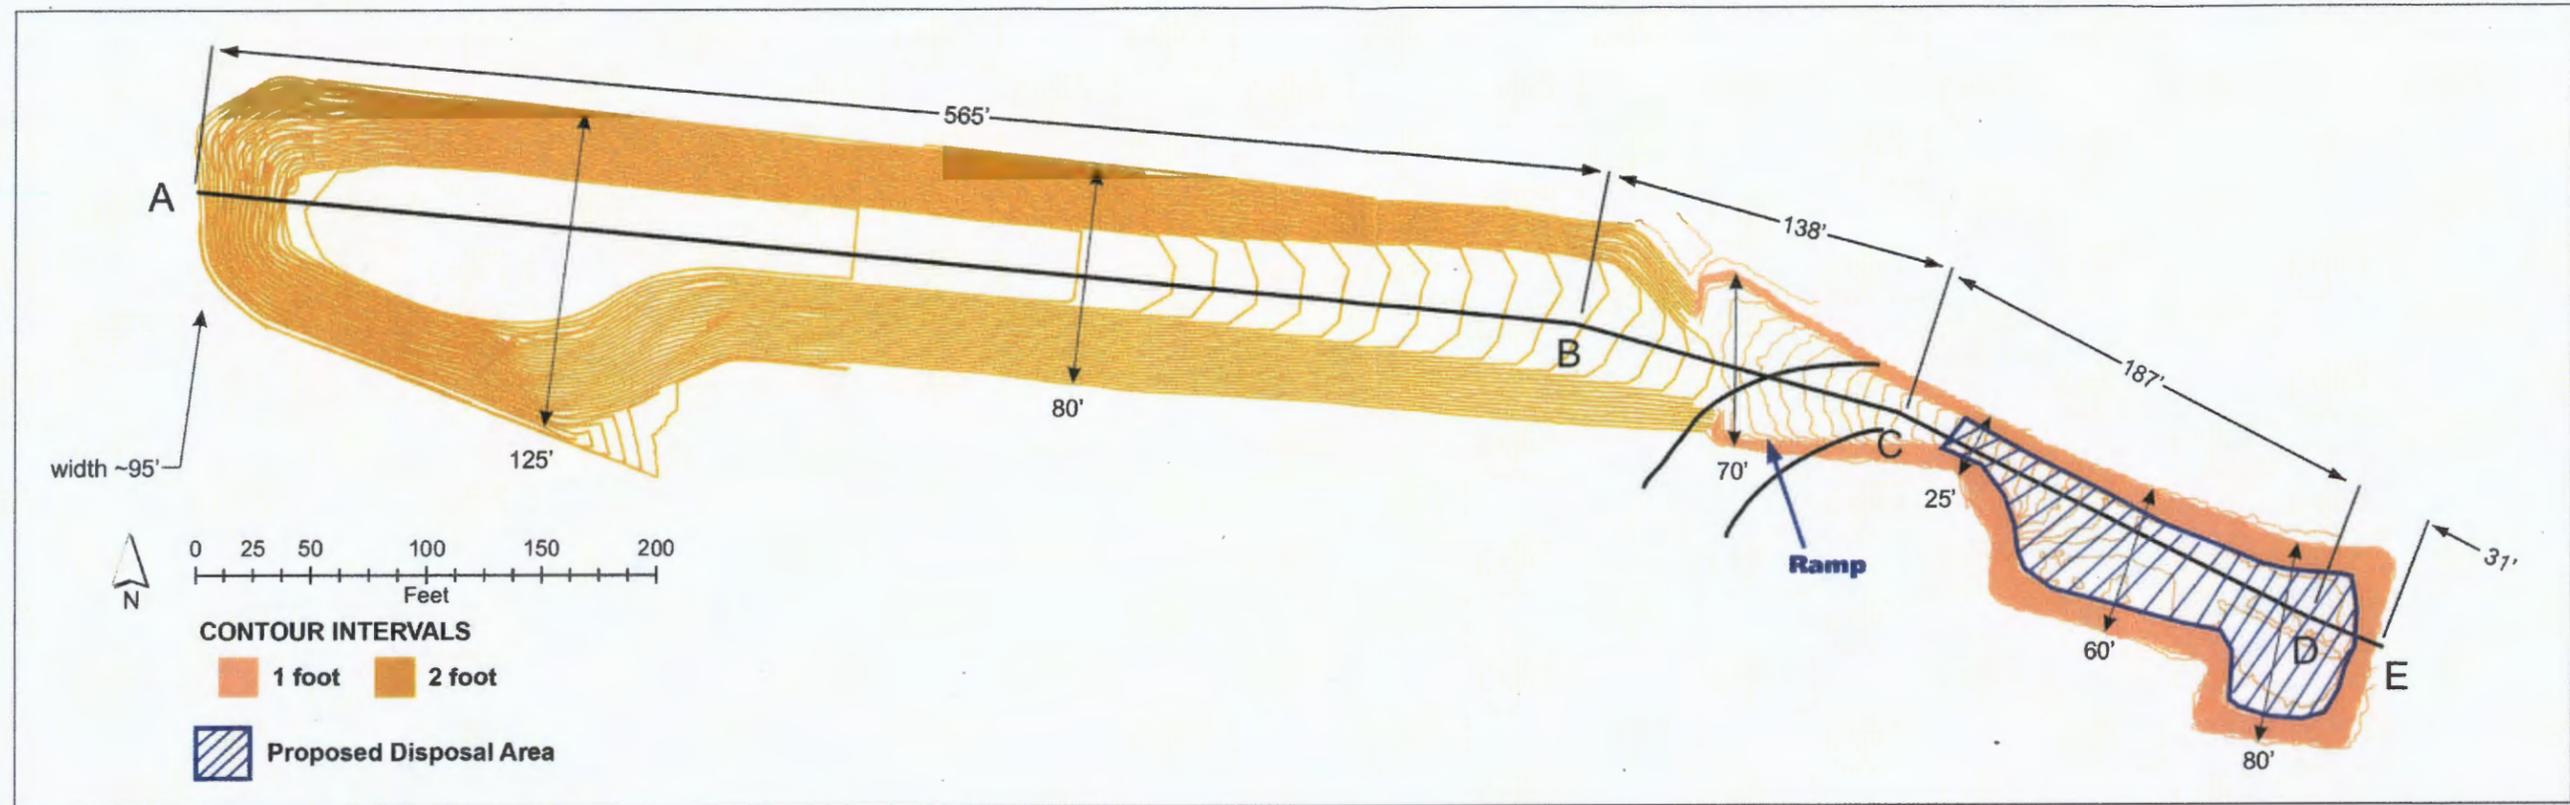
Pit 38 Dimensions and Proposed Waste Placement
